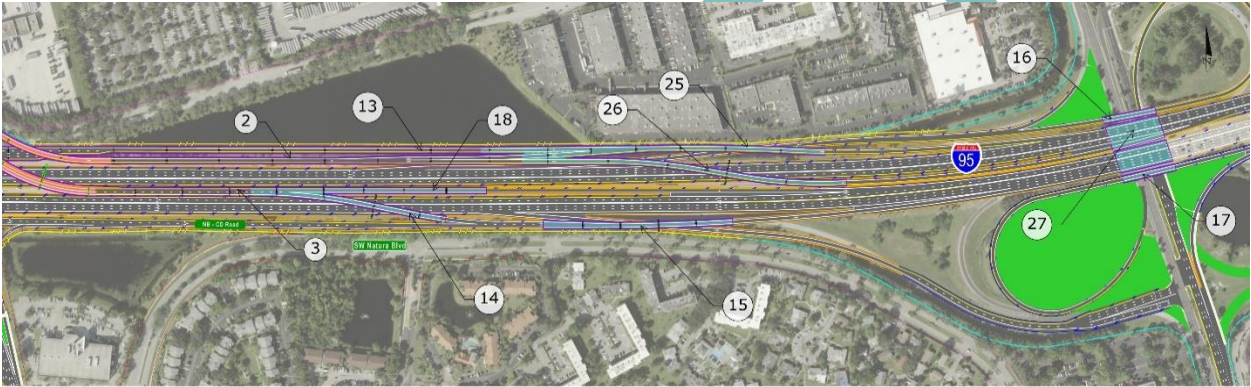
9: Proposed Bridge Locations (2 of 3)
